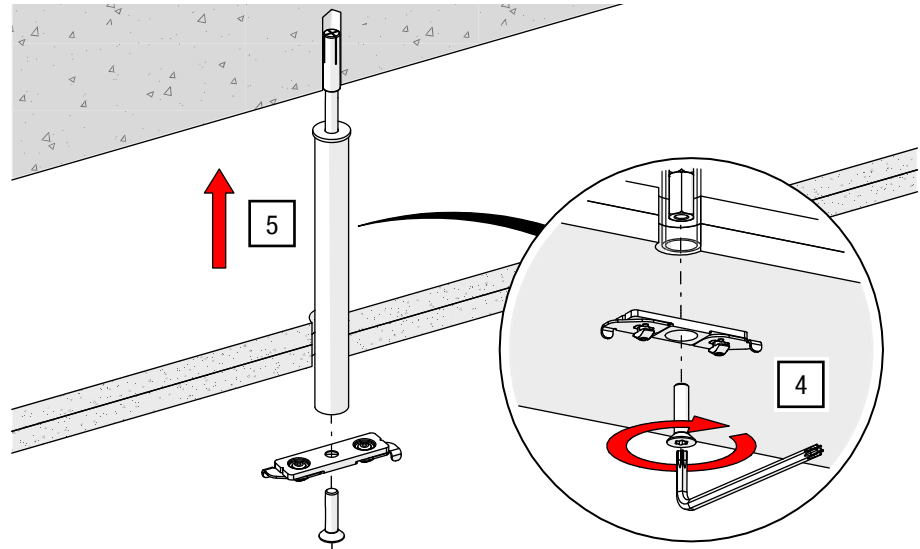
Ceiling suspension OFFICE – Ceiling mount bracket to suspension
